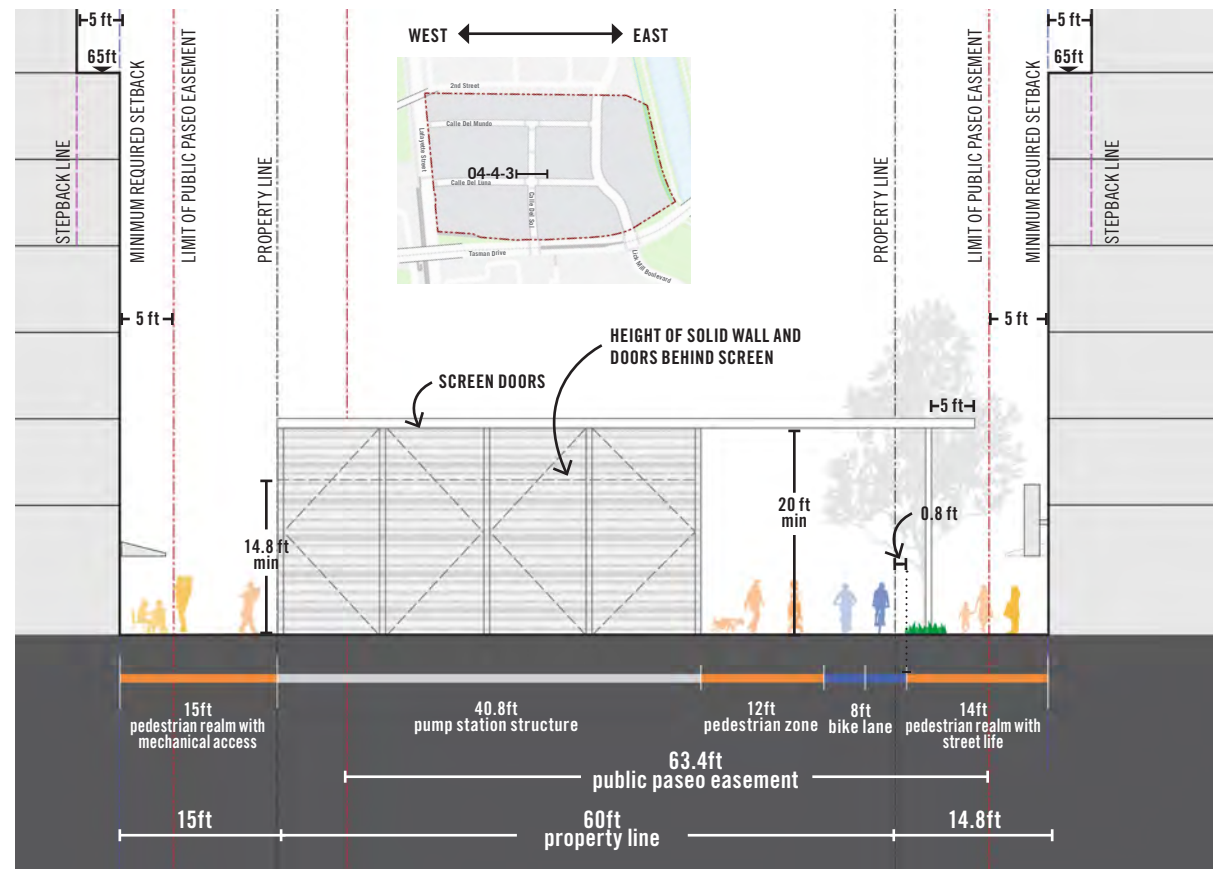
Calle Del Sol Street Section: North of Calle de Luna
